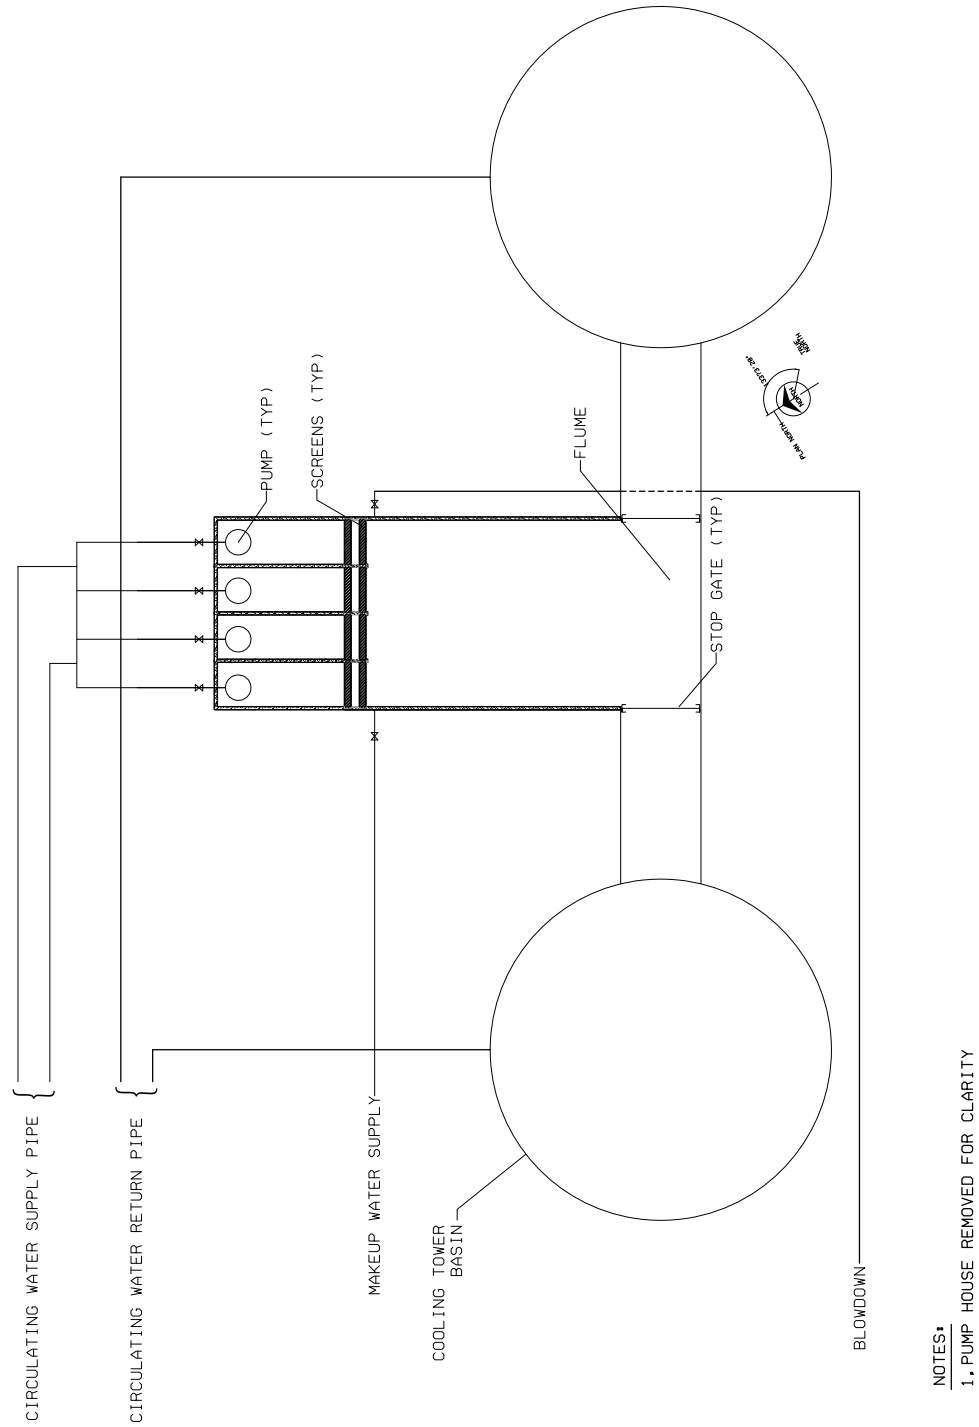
{Circulating Water System Pump Intake Structure (Plan View)}
